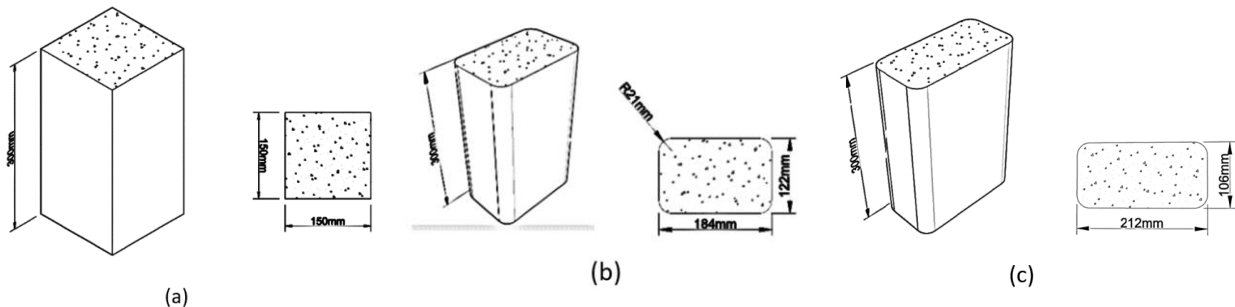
Details of test specimens: (a) square specimen; (b) rectangular specimen (L/W=1.5); (c) rectangular specimen (L/W=2)
